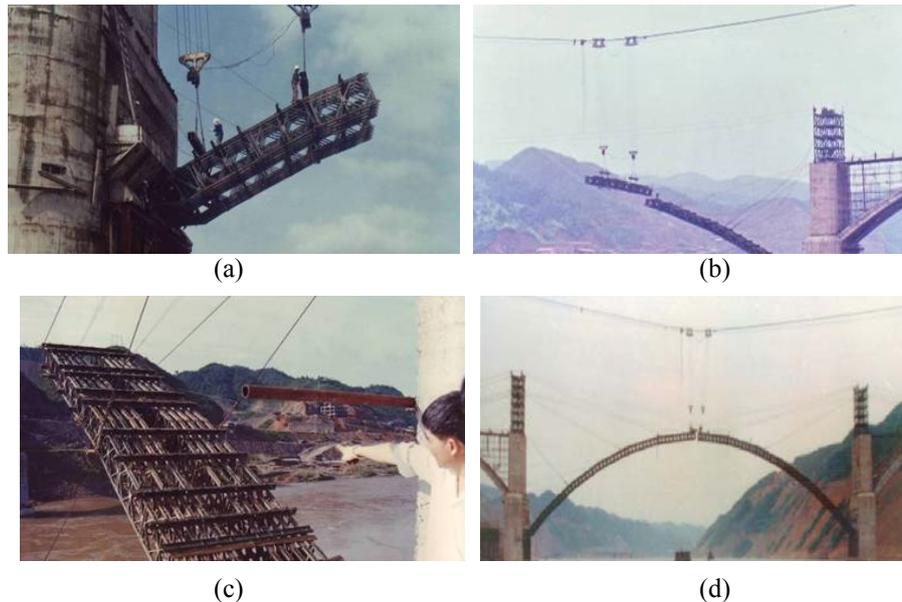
Cable-stayed Bailey steel arch construction installation(a) Section A Steel arch construction installation, (b)Section C steel arch construction installation, (c) Midspan steel arch construction hanging, (d) Period before 133m middle-part connection
